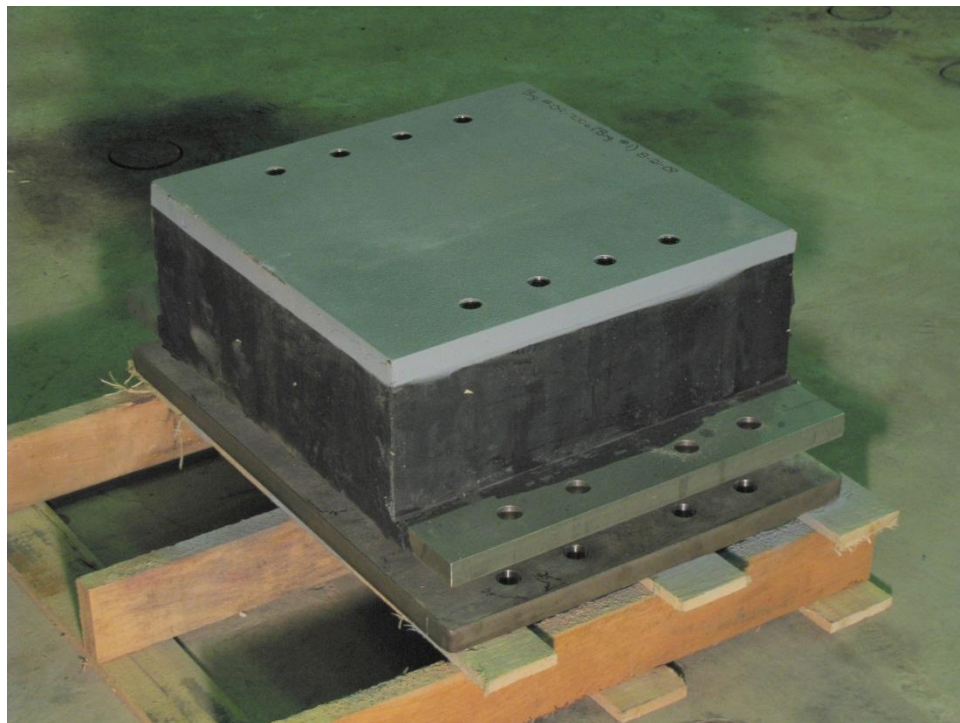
Load Cell Bearing Assembly upon Arrival
